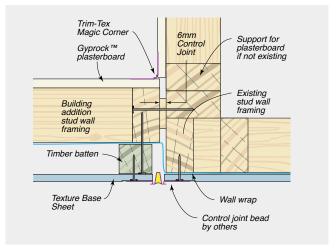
Control Joint at Junction of Framed Construction and Additions – Structural Timber Batten
